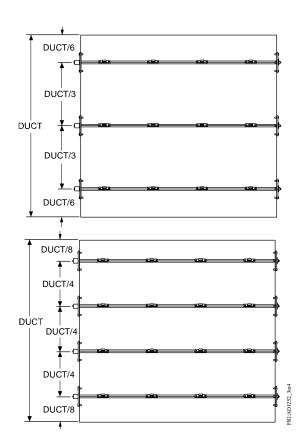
Rectangular Duct Mounting - Three and Four Probe Configurations
